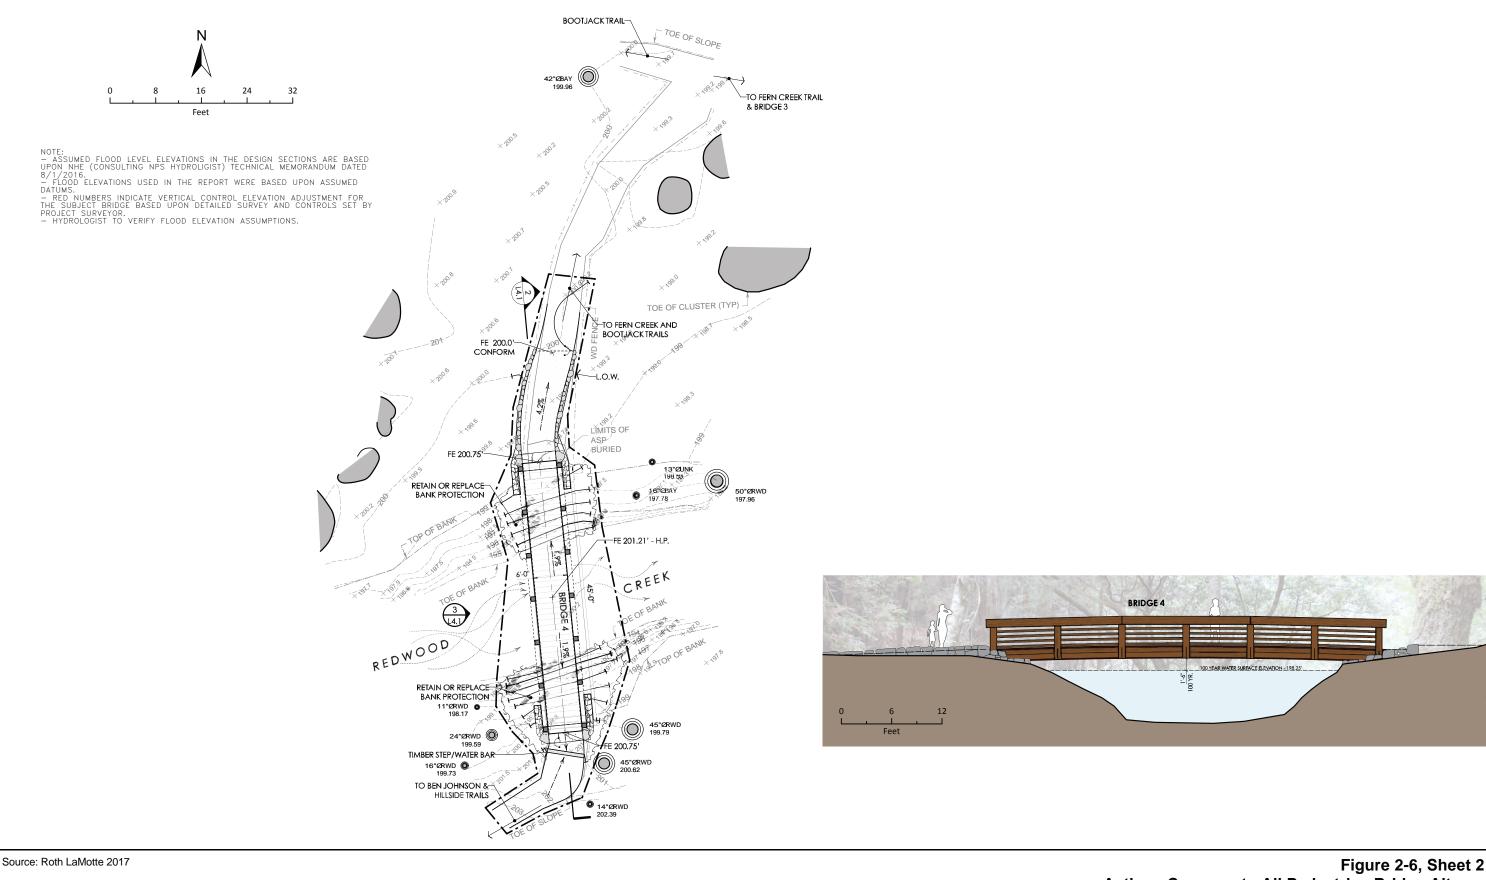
, Sheet 2 of 2. Actions Common to All Pedestrian Bridge Alternatives
